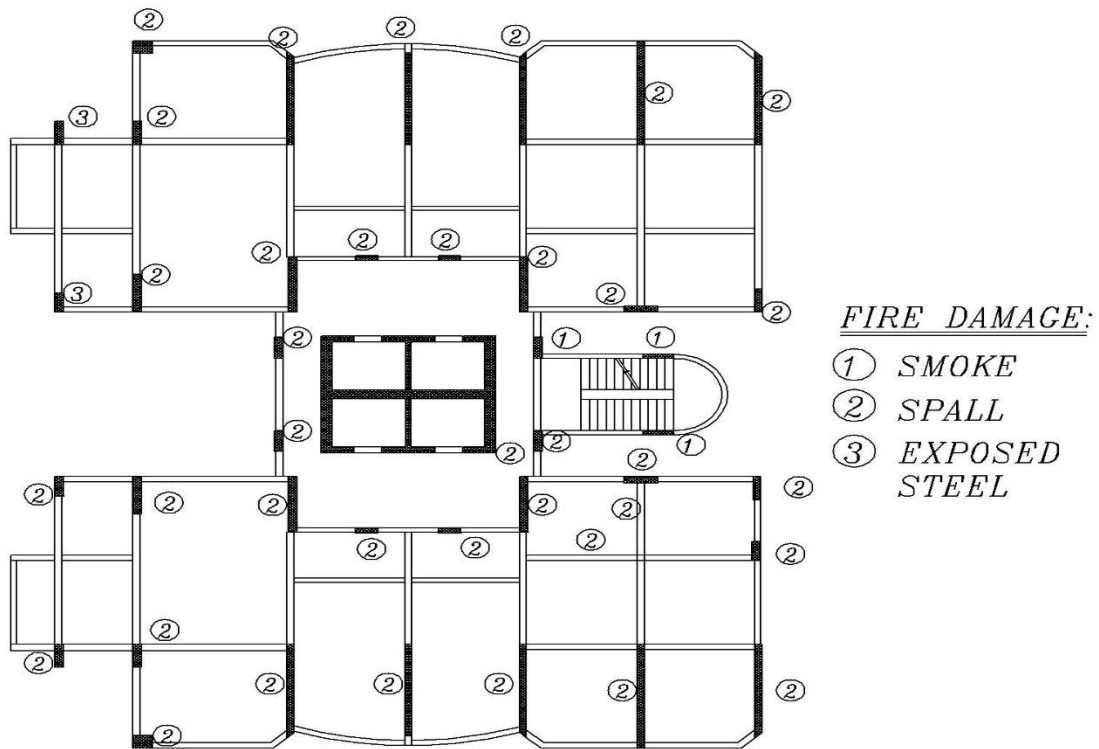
fire damage to 8<sup>th</sup> floor RC. columns/walls zone2
